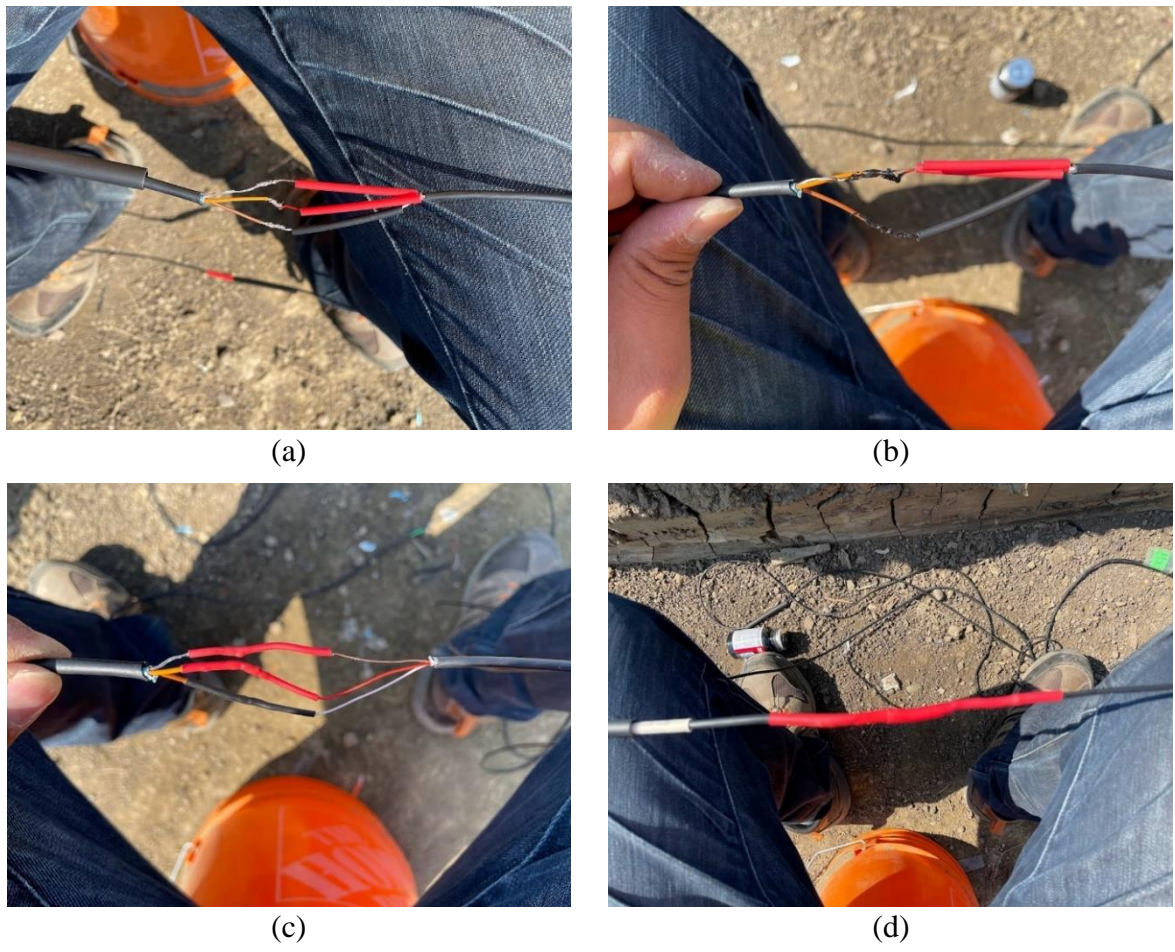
Connection of wire extension: (a) lead splicing, (b) liquid electrical tape cover, (c) shrinking tube protection of leads, and (d) shrinking tube protection of cable
